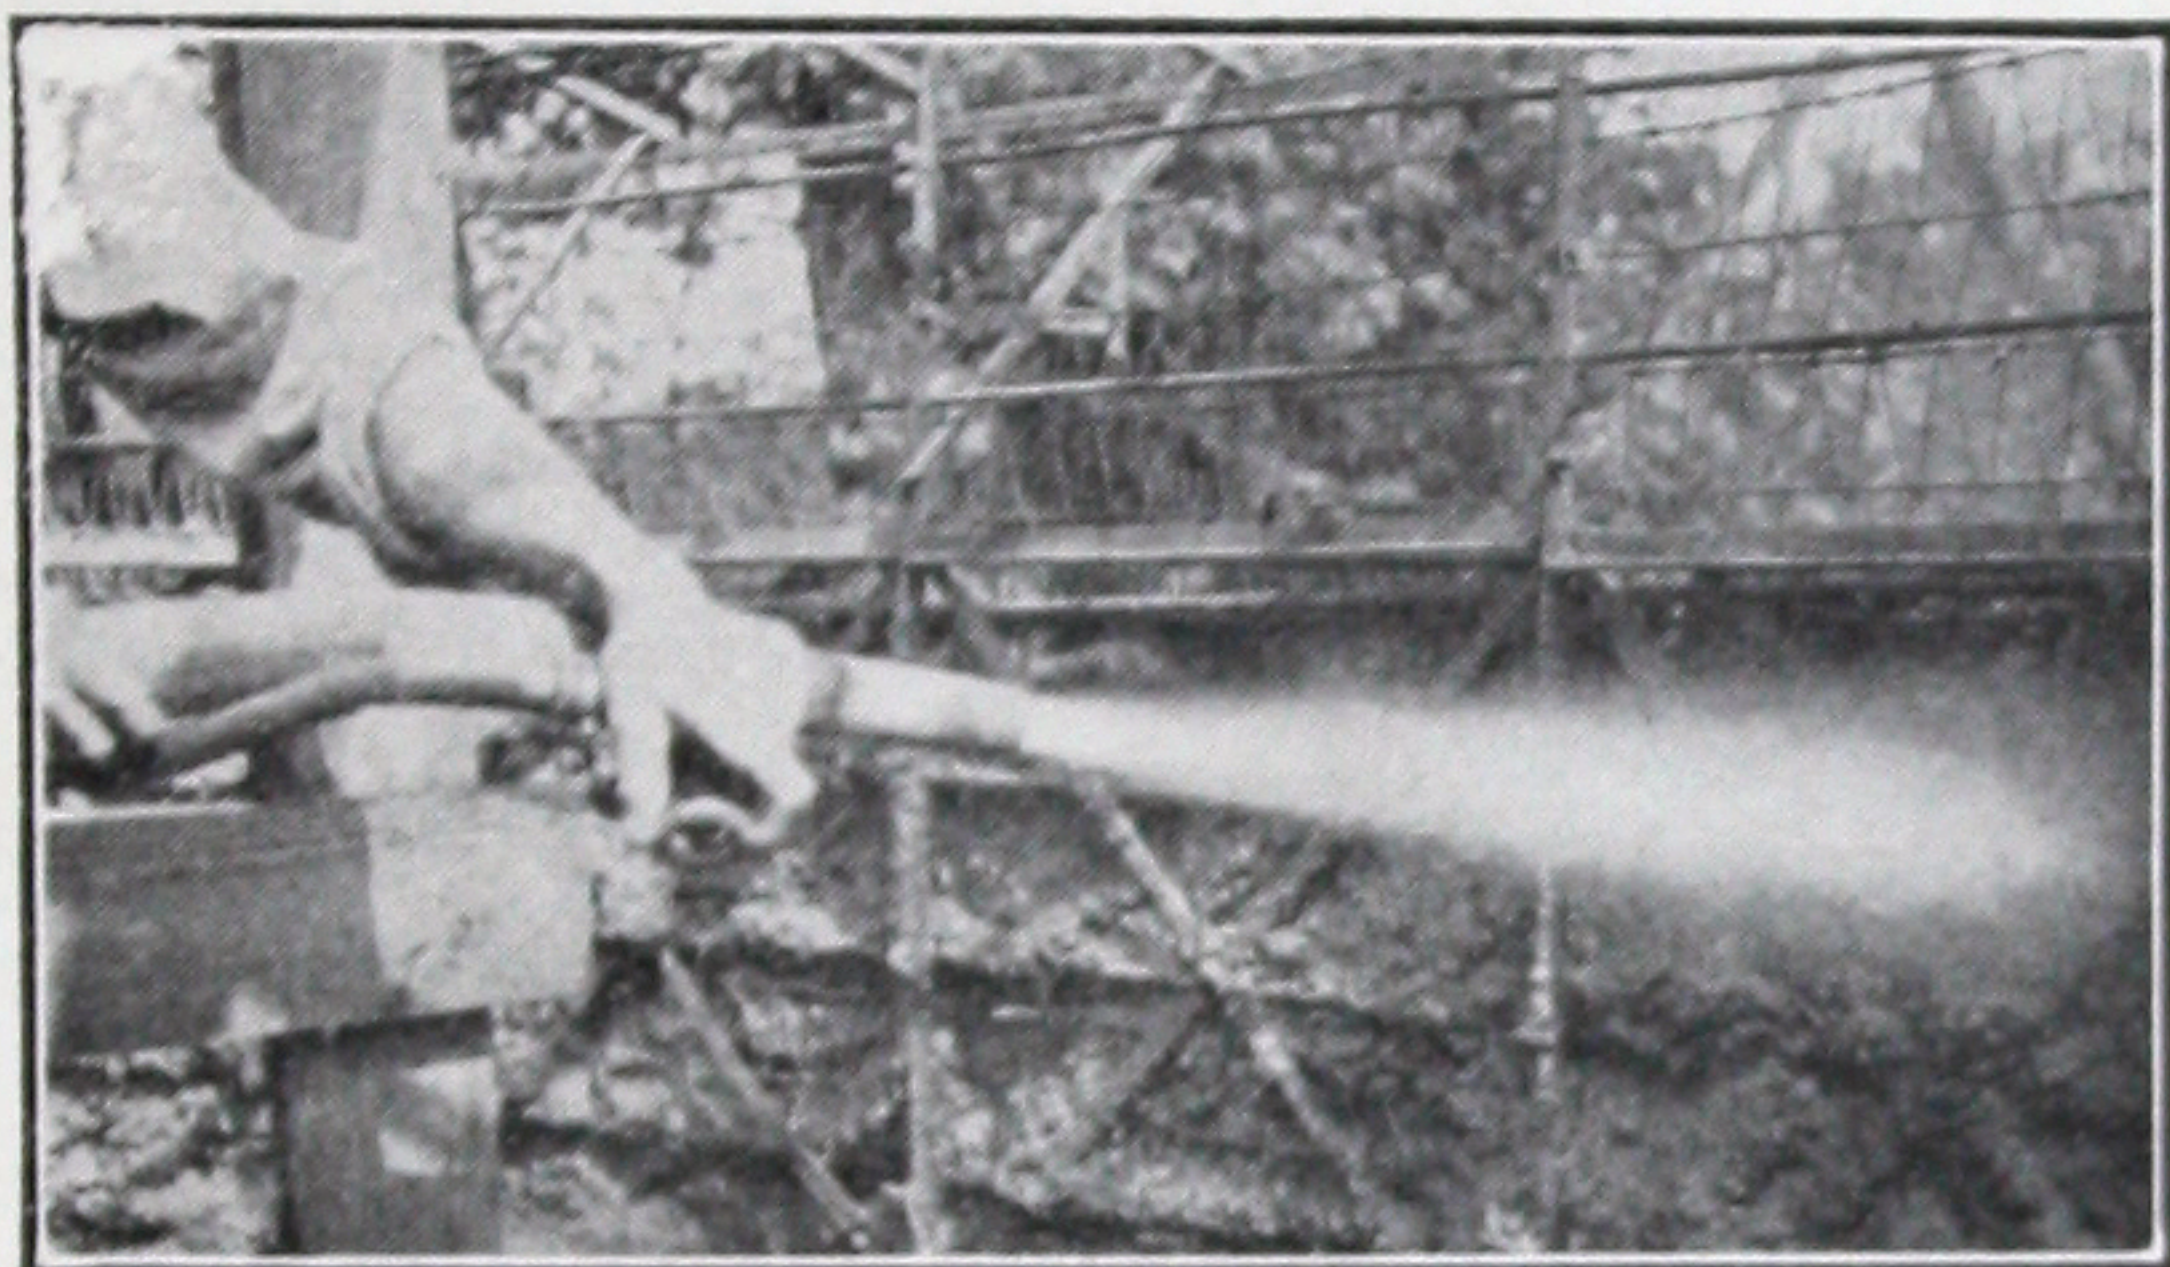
REINFORCED-CONCRETE WATER TOWER BUILT
